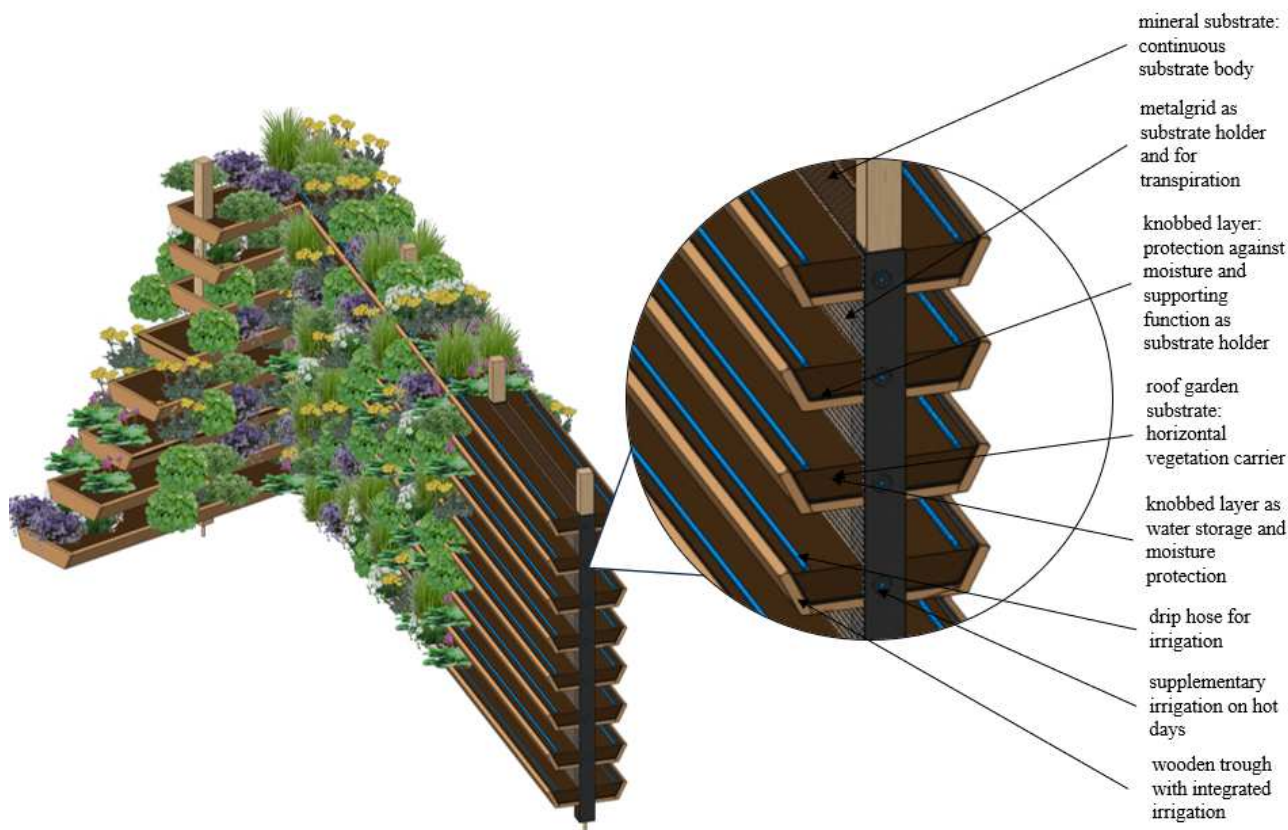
Construction of the EVAPO+ transpiring green wall within the outdoor classroom at the Middle School in Strasshof
